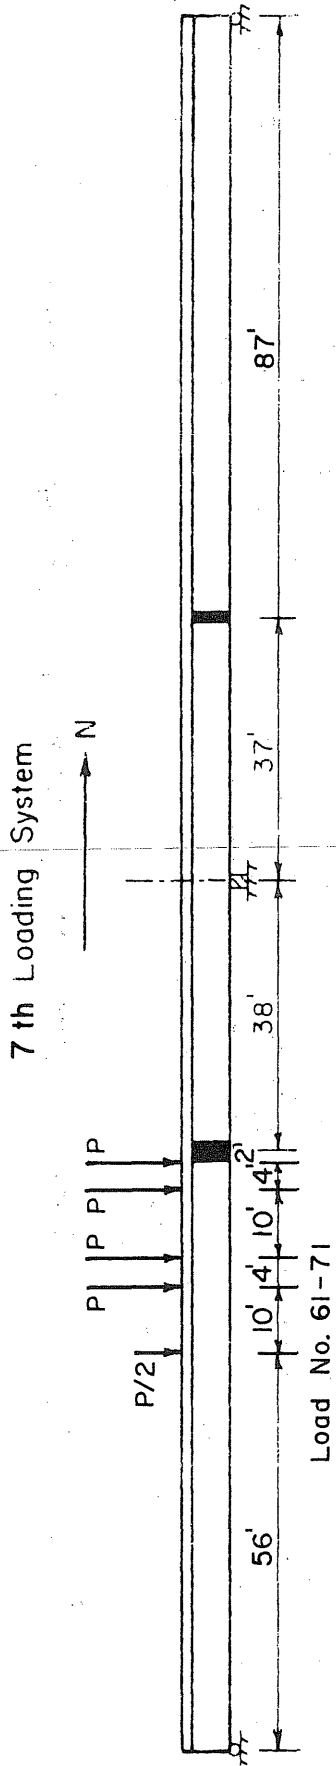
LOCATIONS OF LOADS FOR SOUTH SPAN OVER LOAD TESTS
